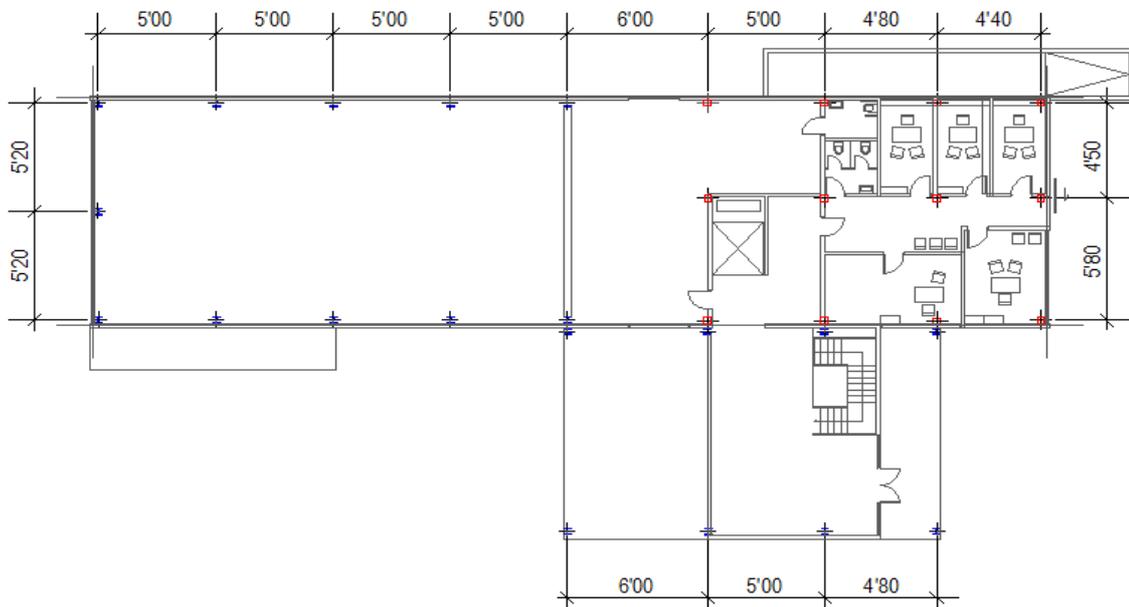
Distribution of pillars on the ground floor. Horizontal section PB
